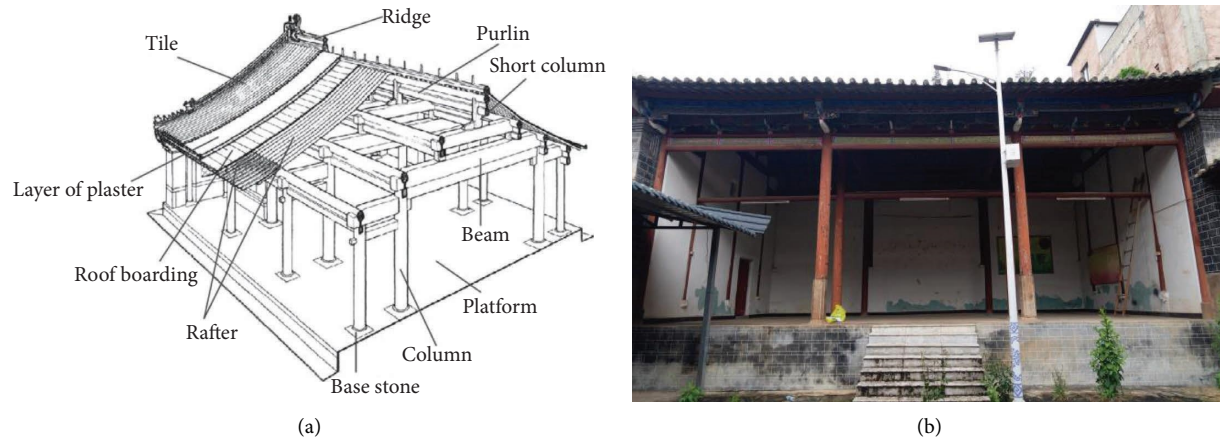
Traditional Chuan-Dou style wooden structure: (a) 3D view of timber frame with laminated beams and columns. (b) A typical Chuan-Dou style wooden structure folk house in Southwest China.
